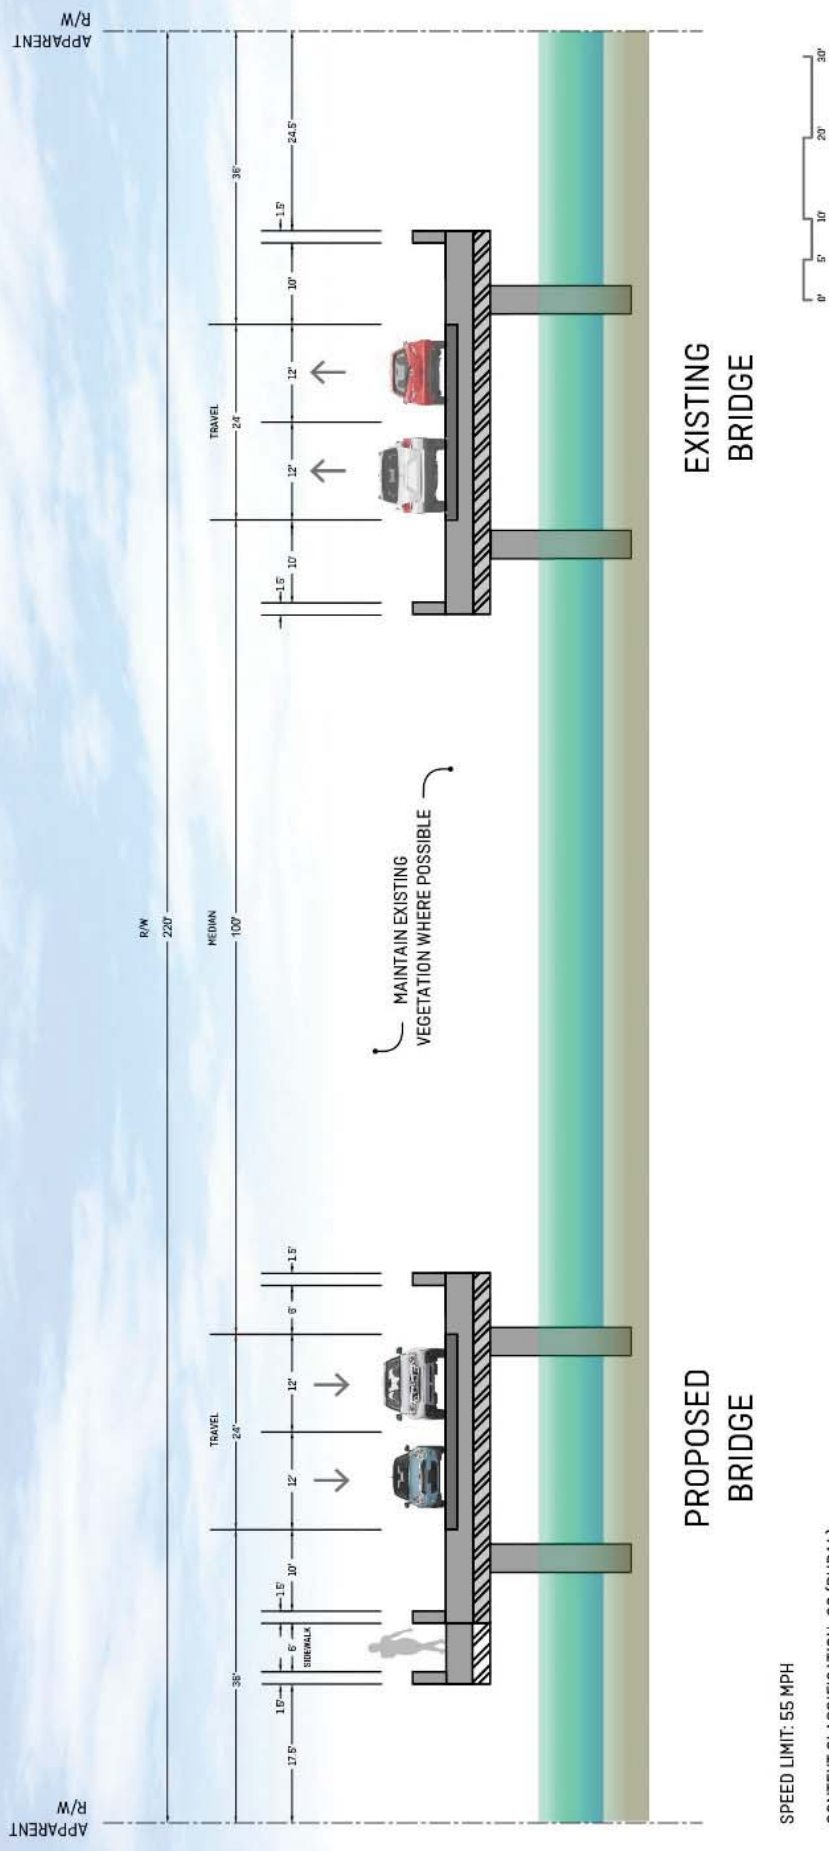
Proposed Section 4 – Reedy Creek Bridge
